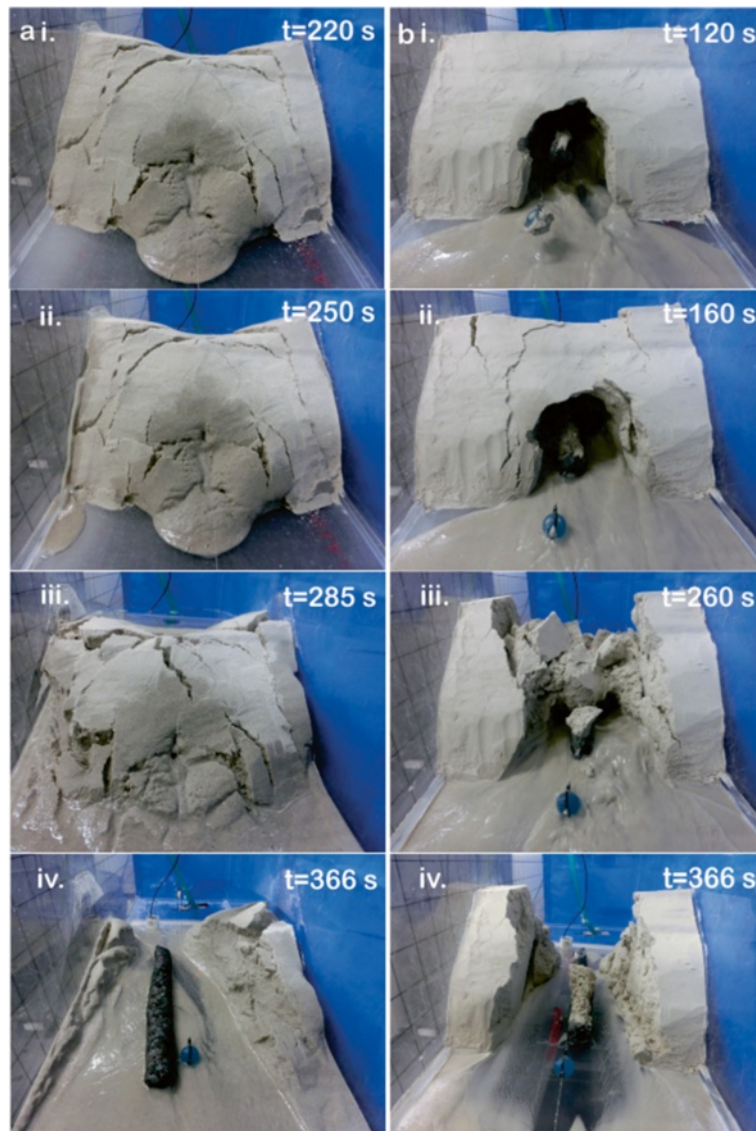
Failure mechanisms of dams built with a dam mix G and b dam mix H showing hydraulic cracking, downstream face saturation and piping (photo by Okeke AC)
